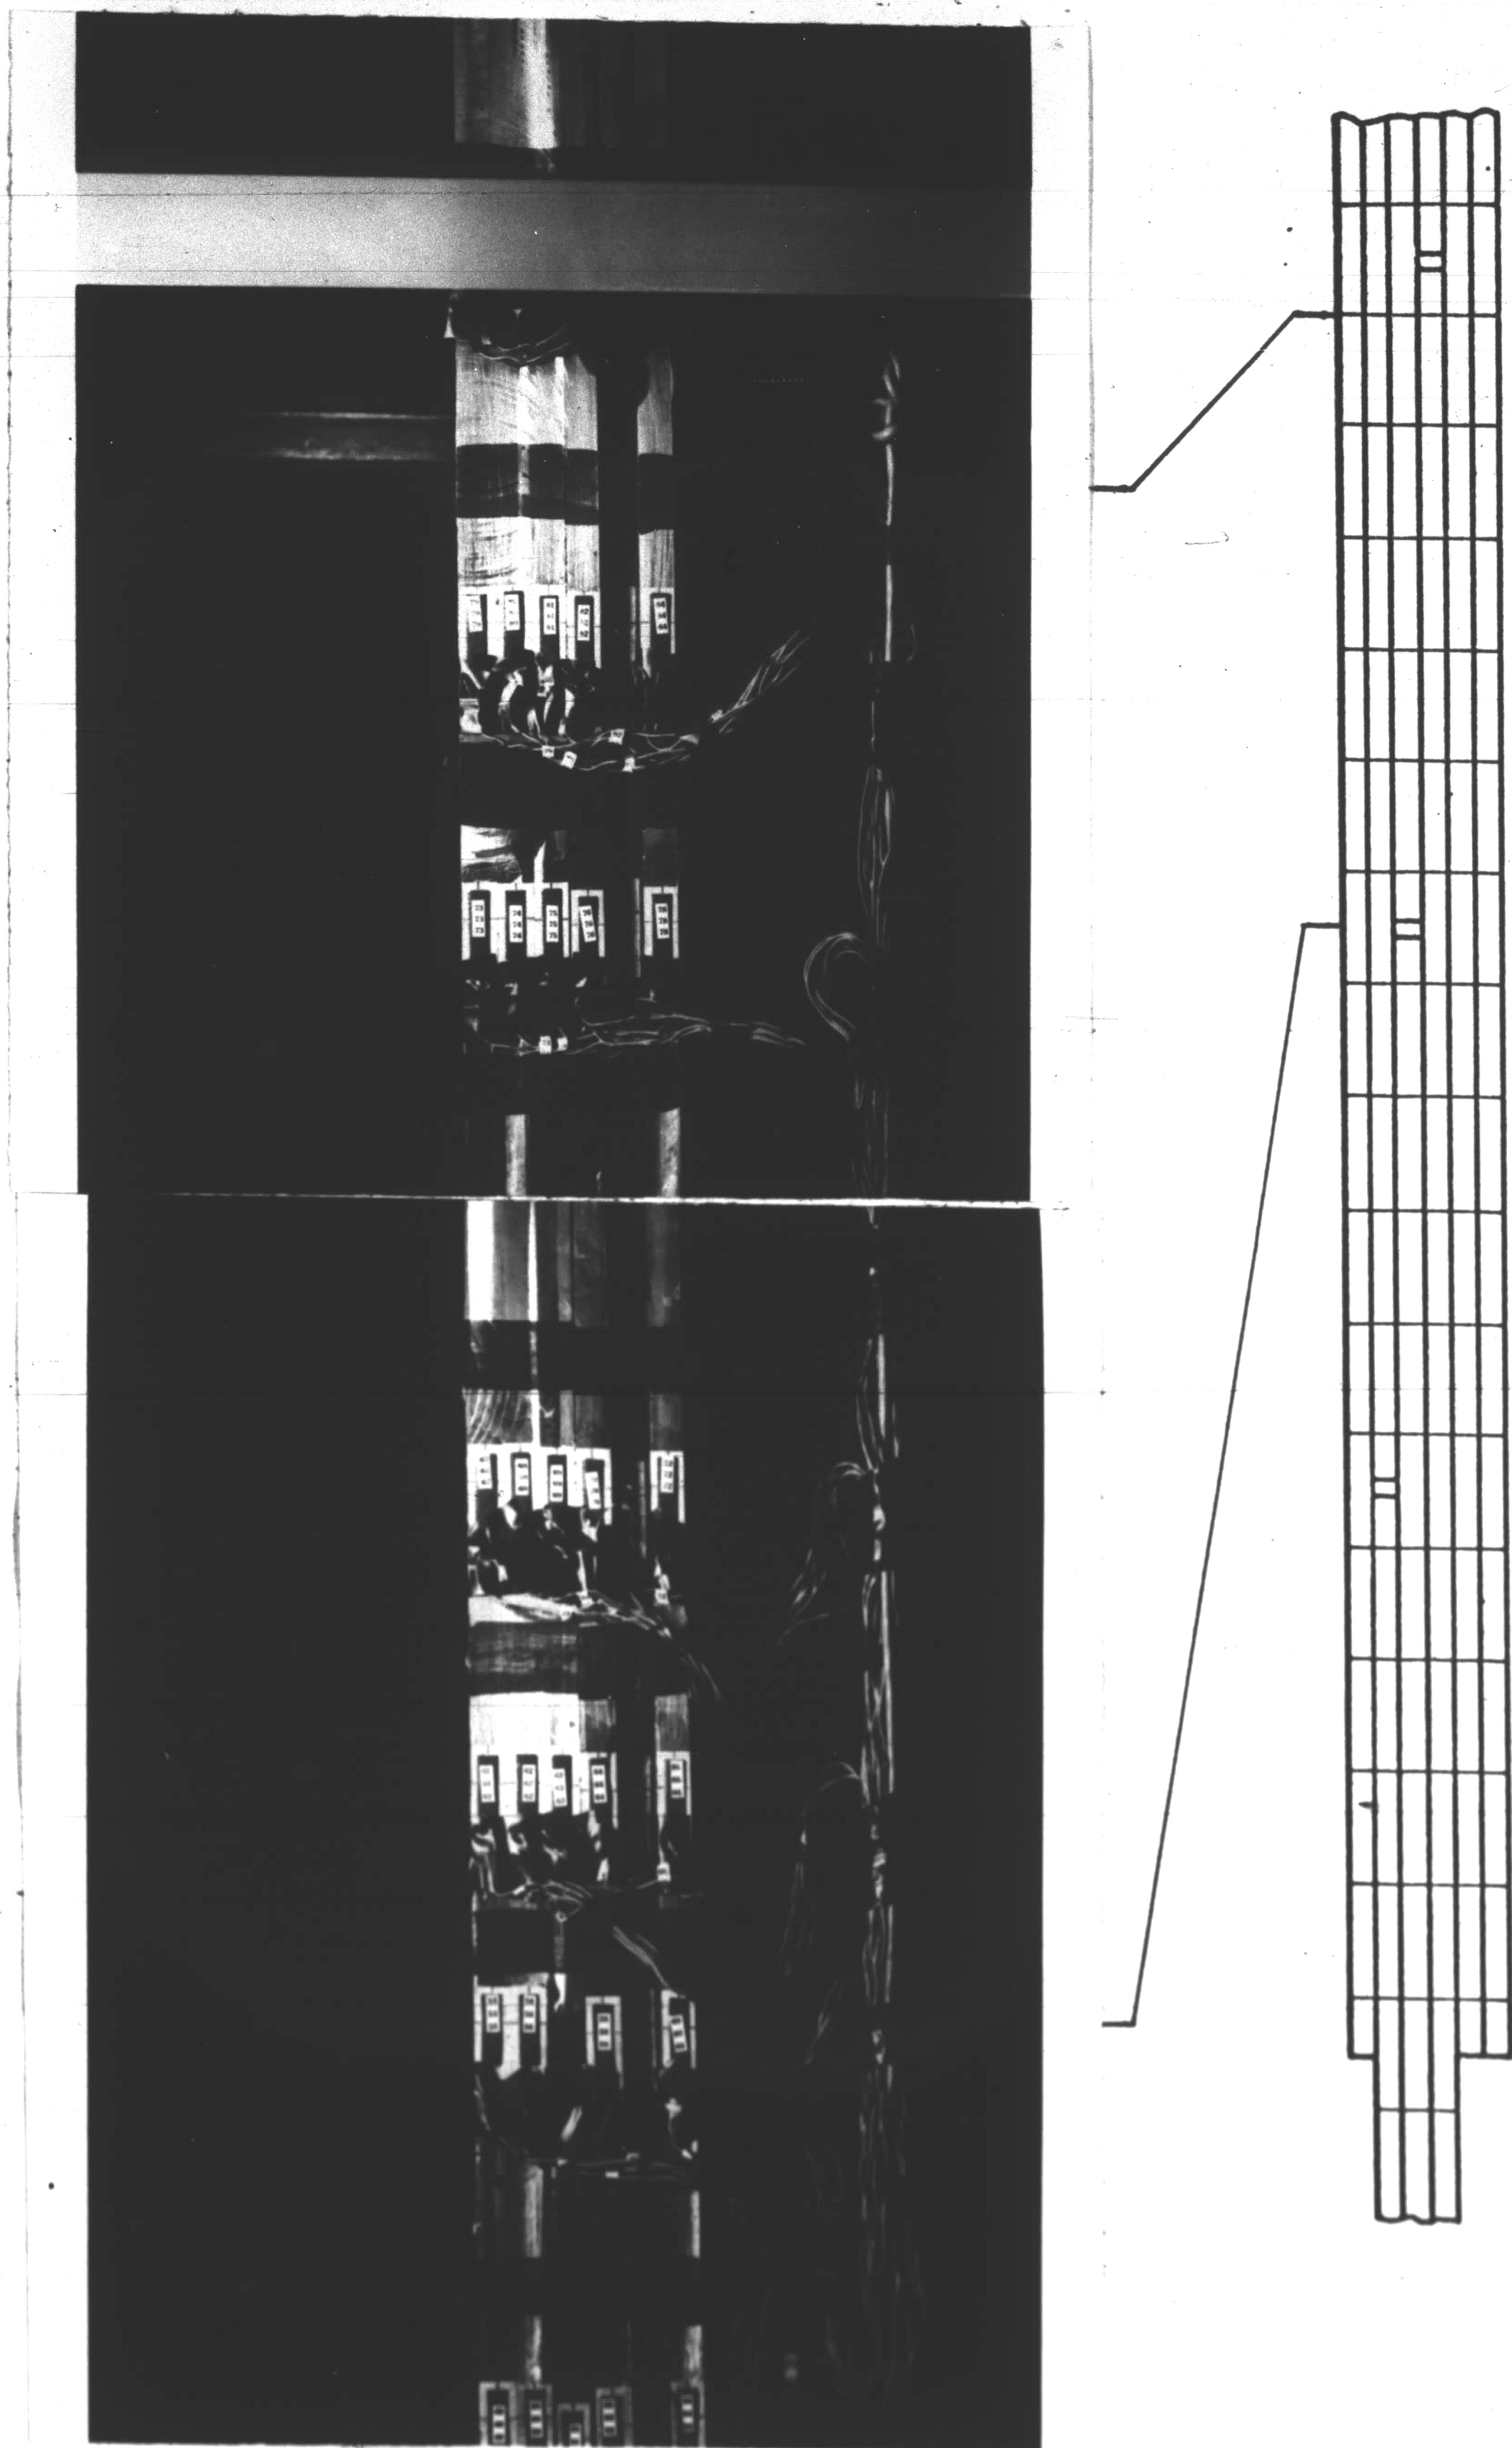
MODIFIED RIVETED JOINT AFTER FAILURE - PORTION III
